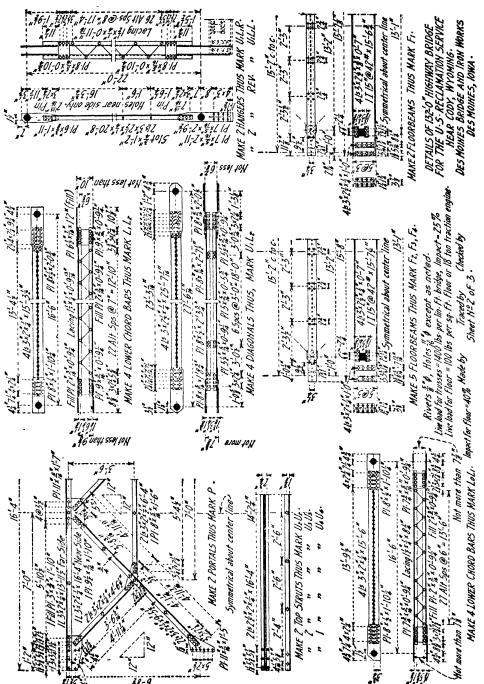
DETAILS OF A PIN-CONNECTED HIGHWAY BRIDGE.
